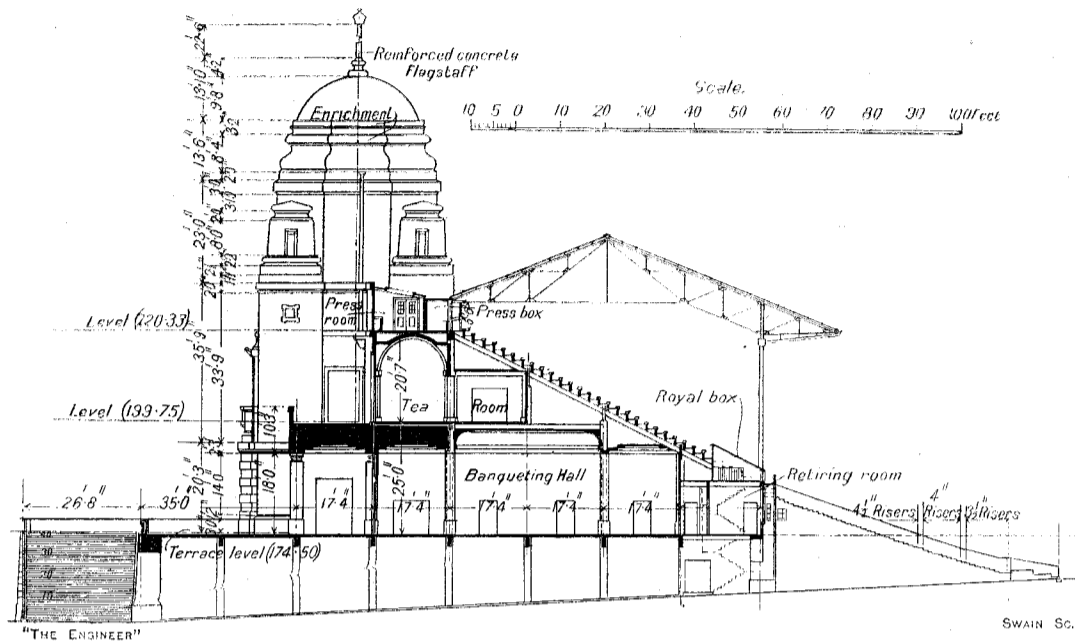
CROSS SECTION THROUGH BUILDING ON NORTH FRONT
